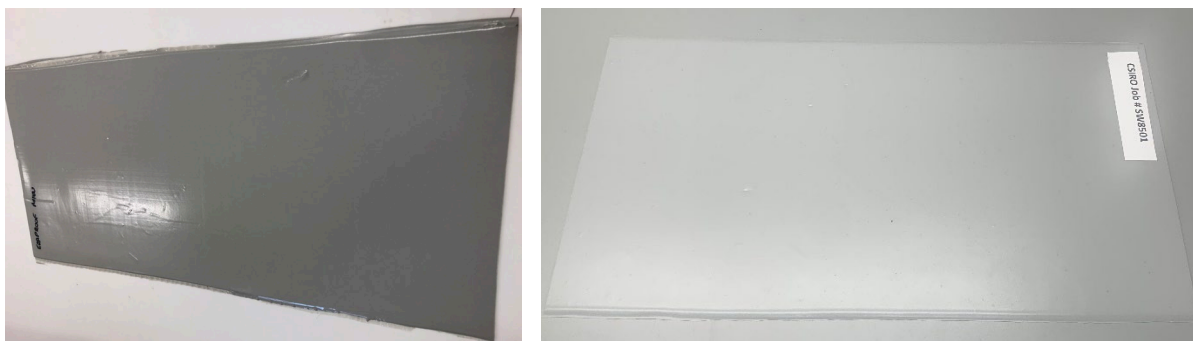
Top face of Nitoproof 910 – Waterproofing Membrane
